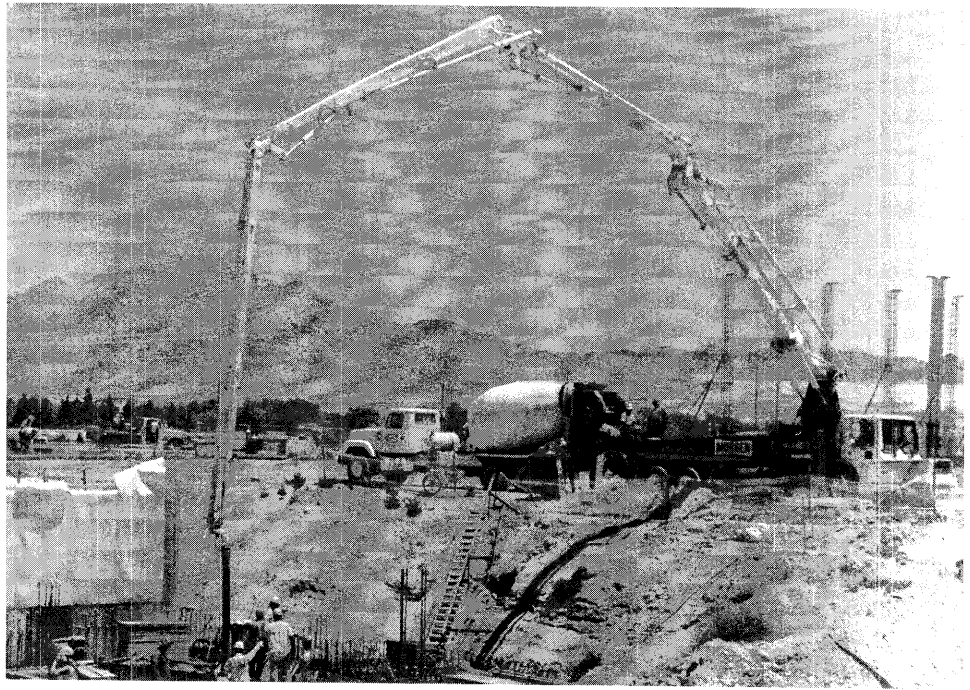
Concrete pump and truck mixer. (Courtesy of Morgen Manufacturing Co.)
